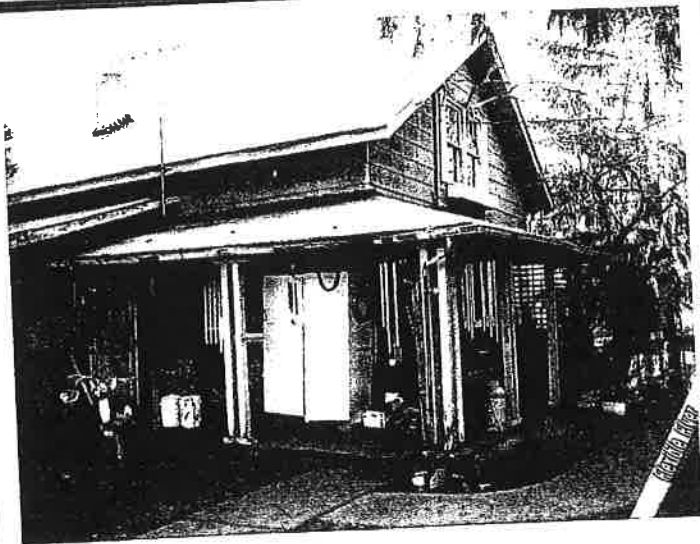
Northern house observed on subject site. Siding is asphaltic shingle material.
